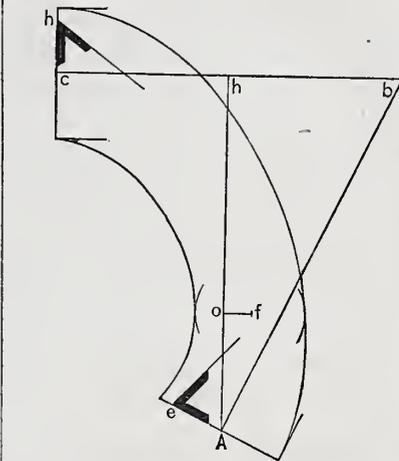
Laying Out the Pattern of the Wreath-piece.
